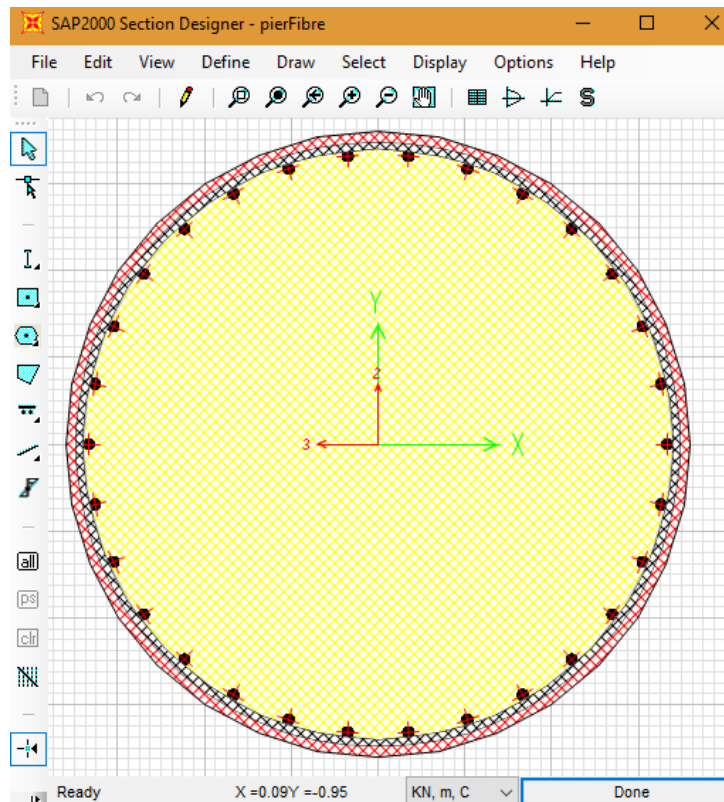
(b): Long Column Section Designed as per IRC:6-2014
